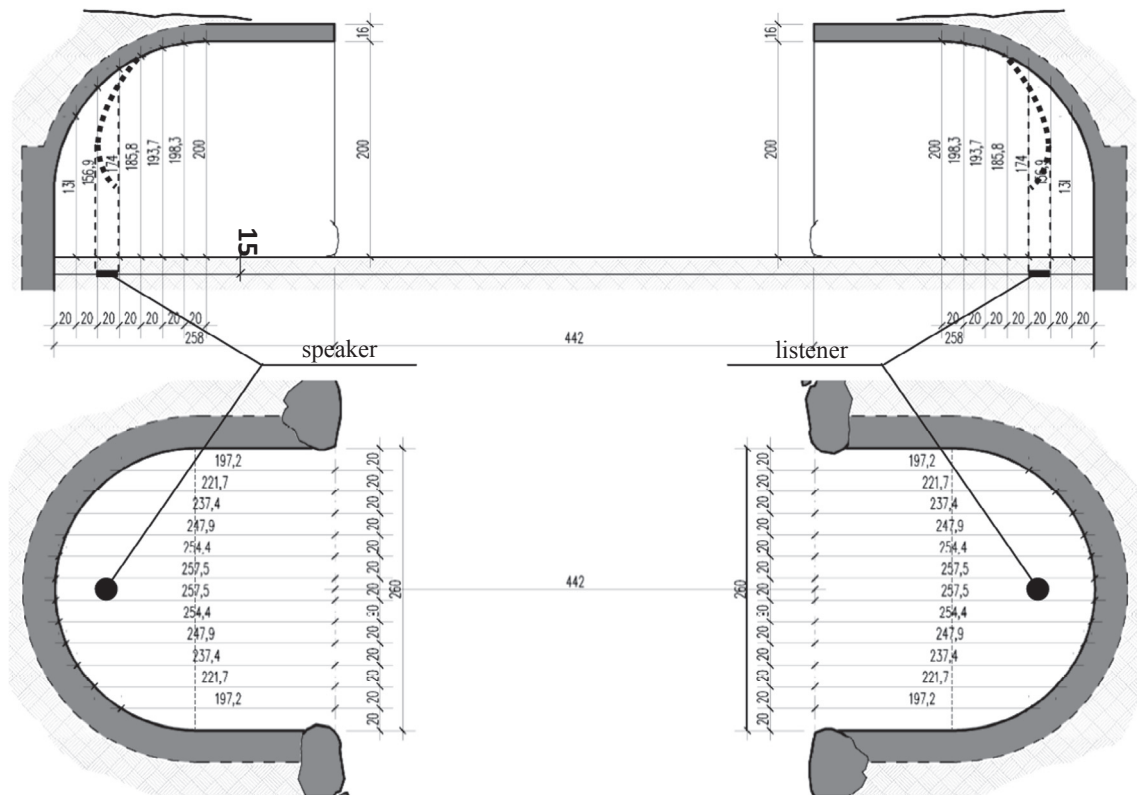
Correct positions of the speaker and the listener in the grottoes vertical cross-section and on the groundplan.
